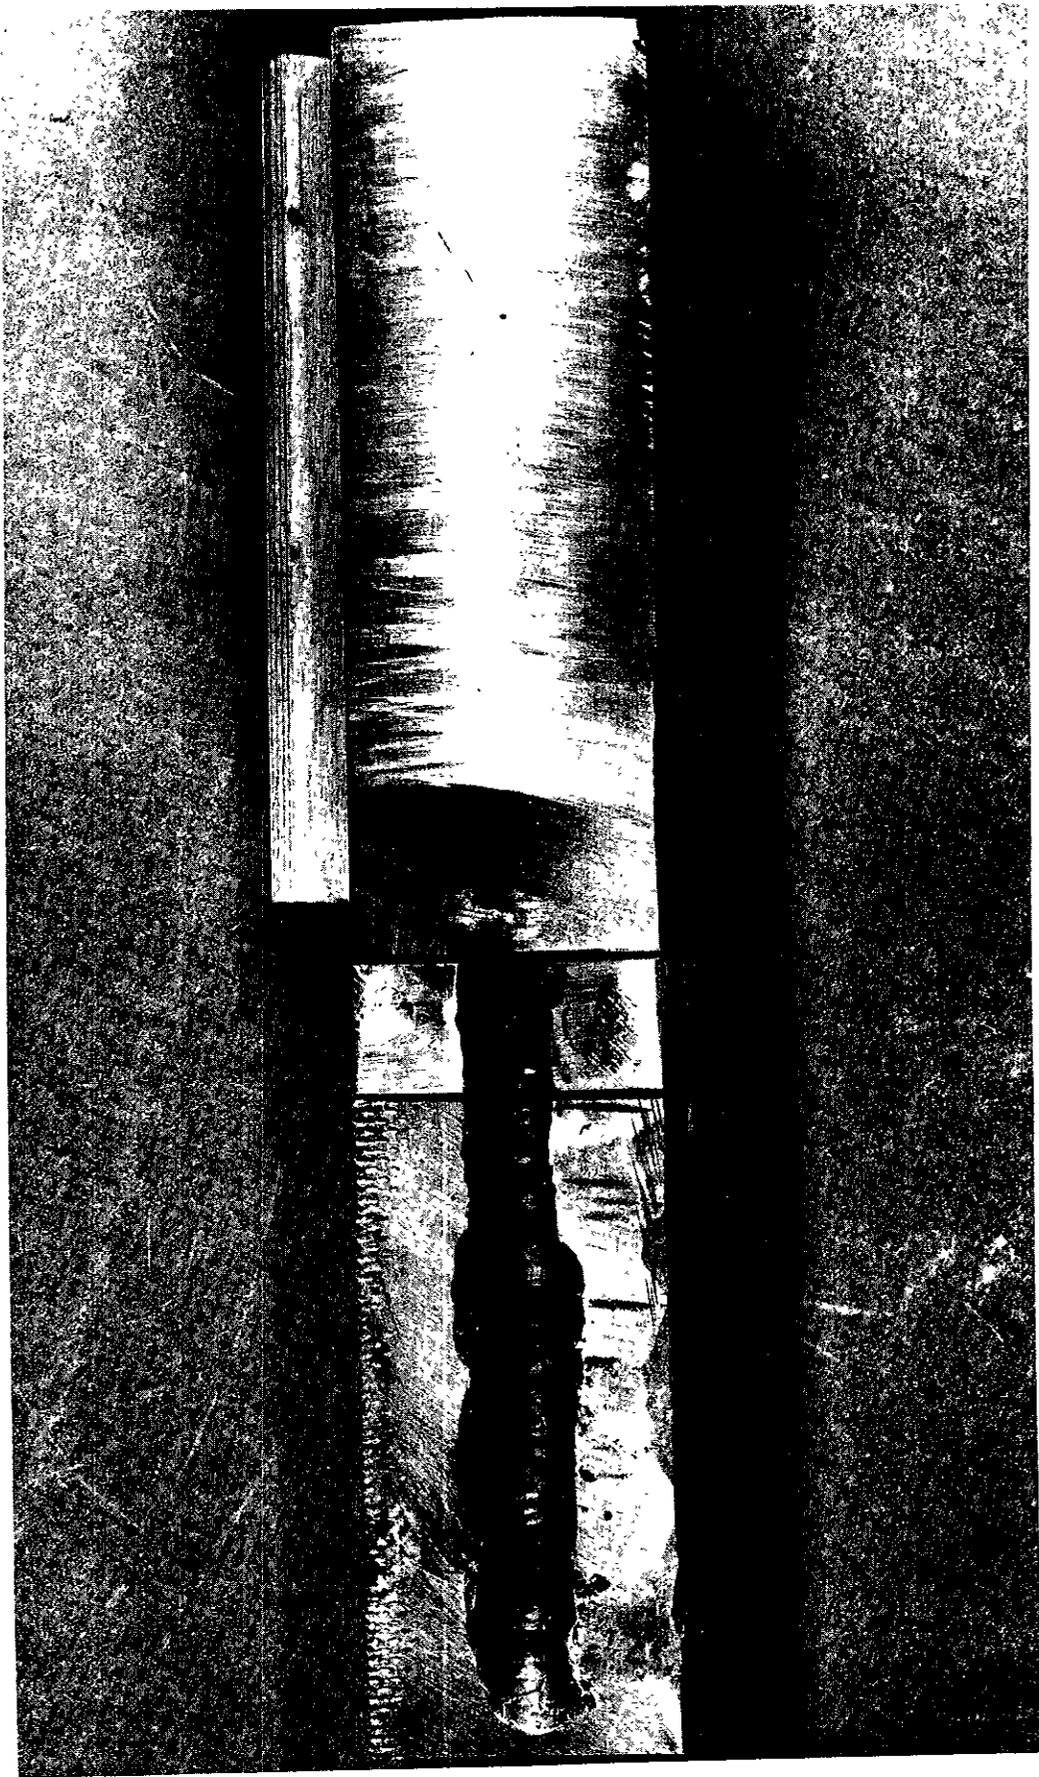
Pieces from the top flange sample laid out according to their respective positions in the sample and viewed from the ground flame-cut outside edge of the flange from which the sample was removed. Simple visual inspection of the line of layered inclusion materials visible in the photograph showed it to be virtually continuous throughout the sample. (A fact confirmed by ultrasonic testing.)
